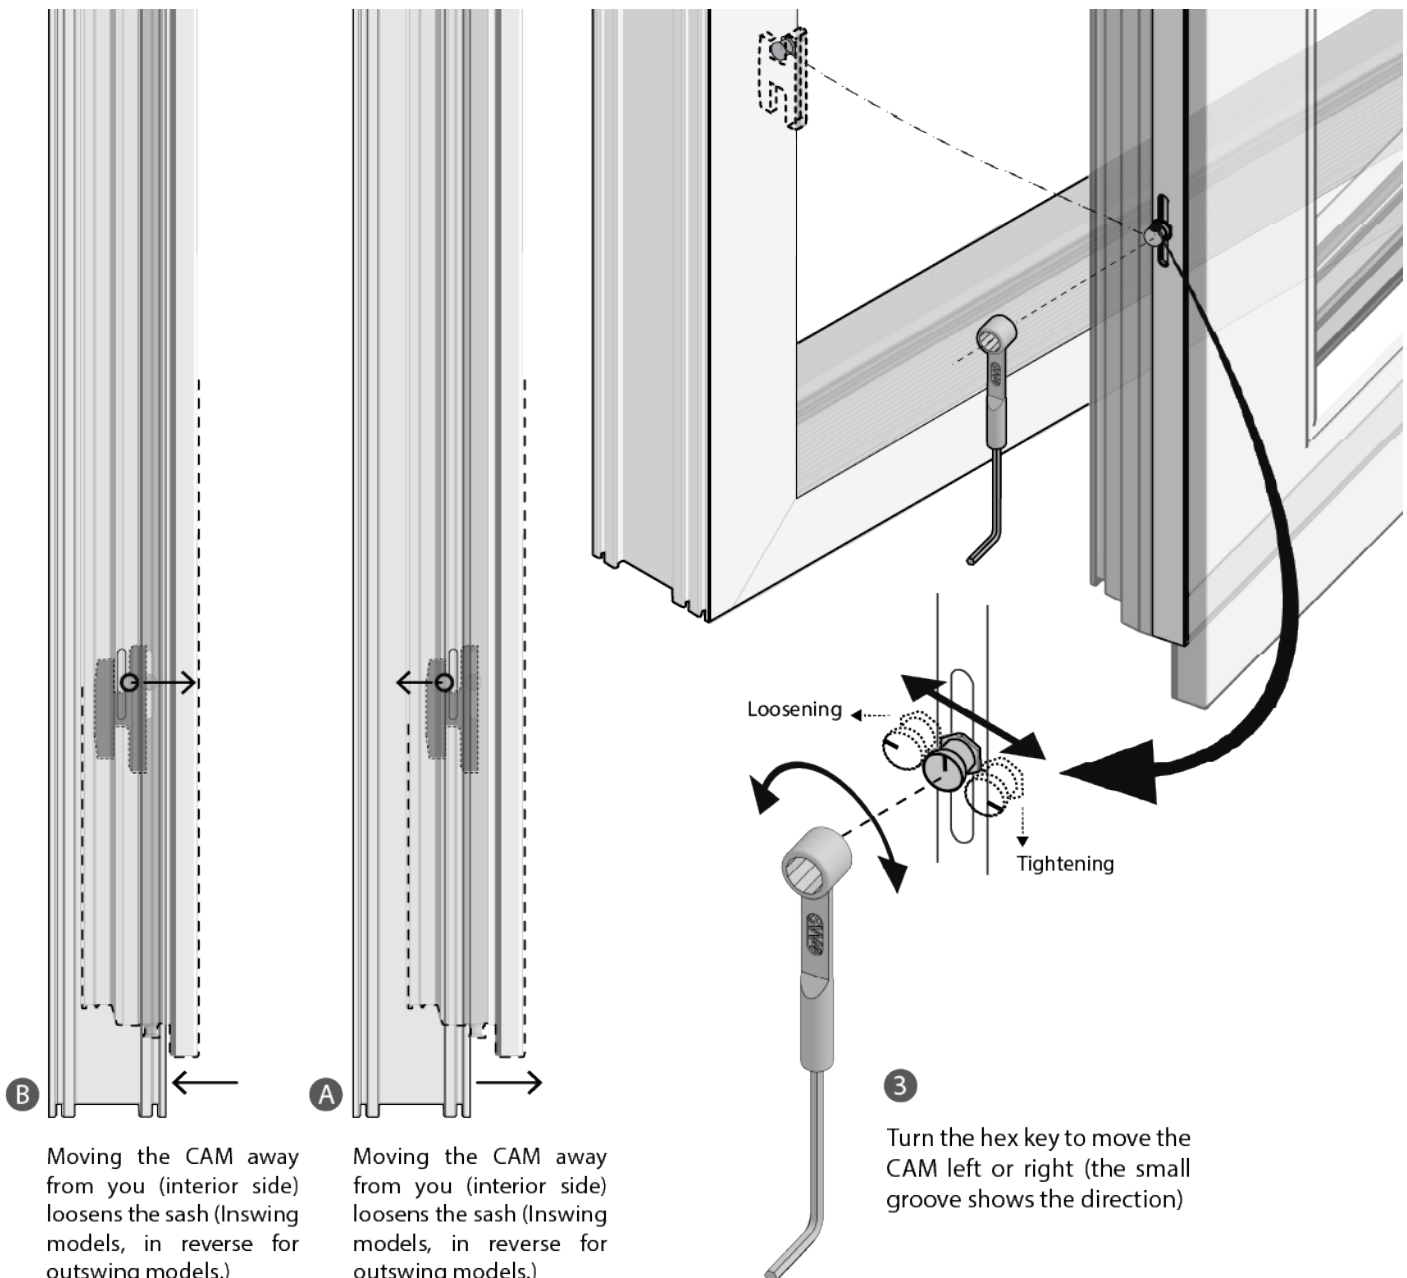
Flat head CAM adjustment. Movement shown is exaggerated for clarity.
